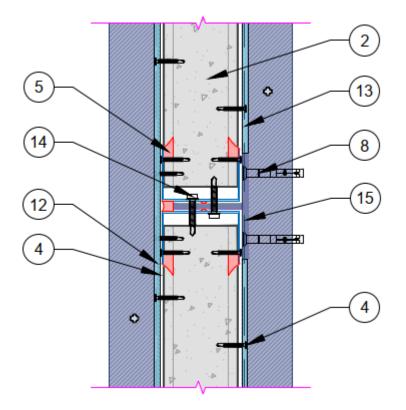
T-bracket connection in dual-stack wall with 6 mm fibre cement lining
